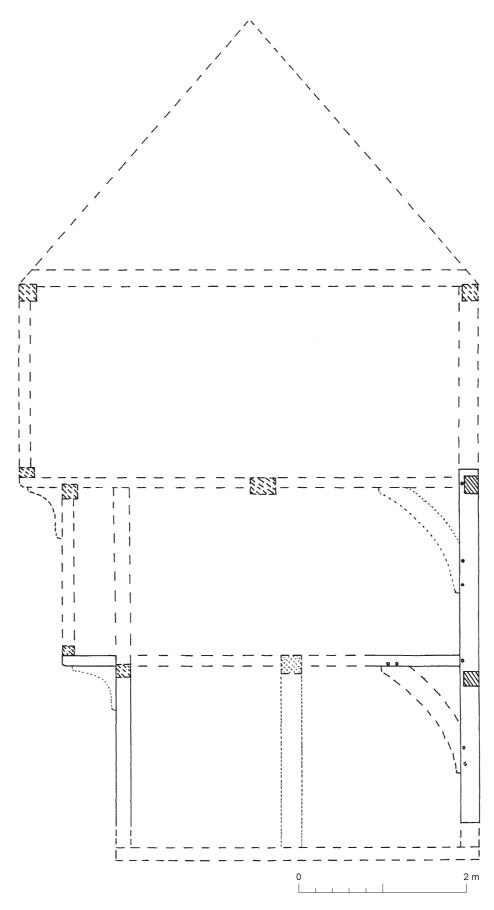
Reconstruction of no 3 Queen Street: cross-section (by R Shackle).
